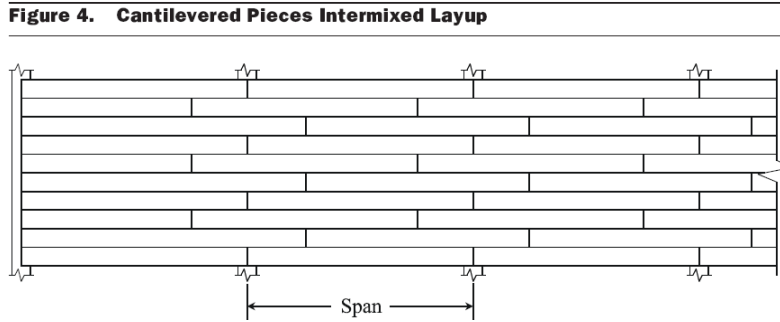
Cantilevered Pieces Intermixed Layup (Image from WCD 2 – Tongue and Groove Roof Decking)
